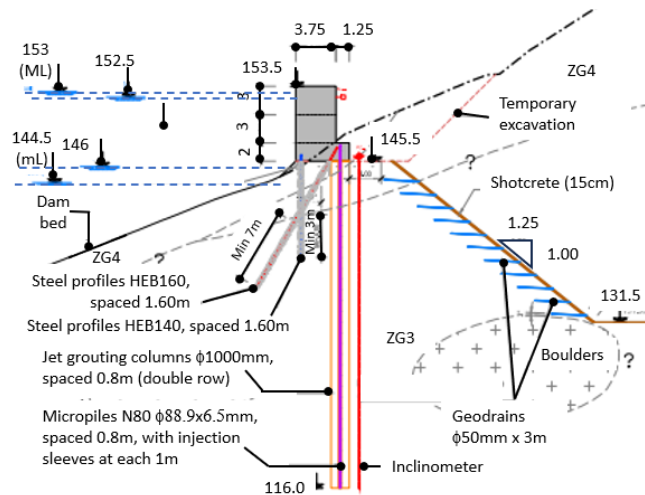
Cofferdam cross section 6-6 (ZG3 intersection).
